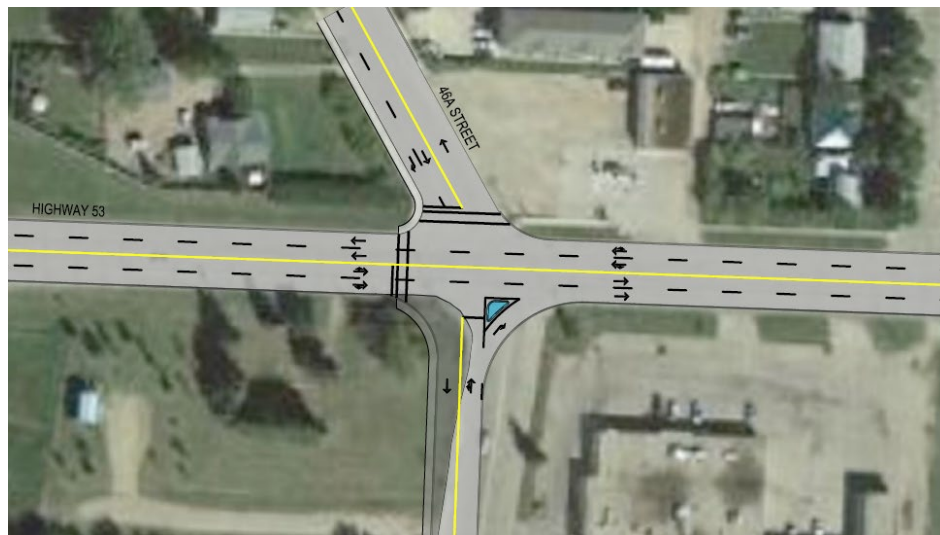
HIGHWAY 52 (39 AVENUE) & 46A STREET PROPOSED CONCEPT IMPROVEMENTS
